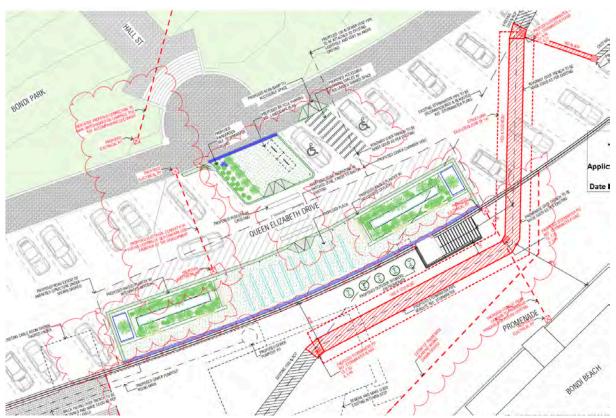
Roof plan / QED road plan for the Southern Amenities showing the proposed platforms and skylights / planters. The toilets and small kiosk are under this. The red clouds indicate where the design was changed from the initial DA drawings. The red hatched dogleg area on the right is the diverted stormwater drain. Source: DA Waverley Council website
